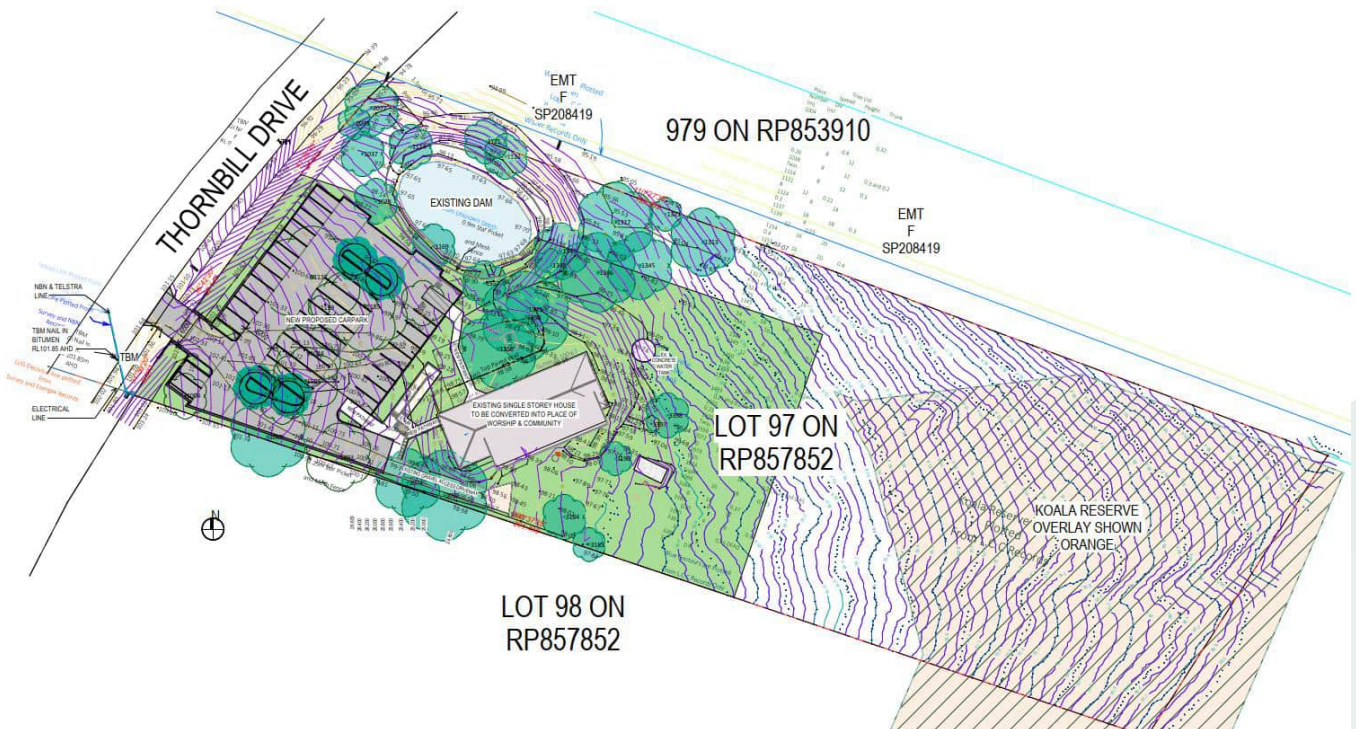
Proposed Architectural Layout Plan (Source: DZ Architects)
